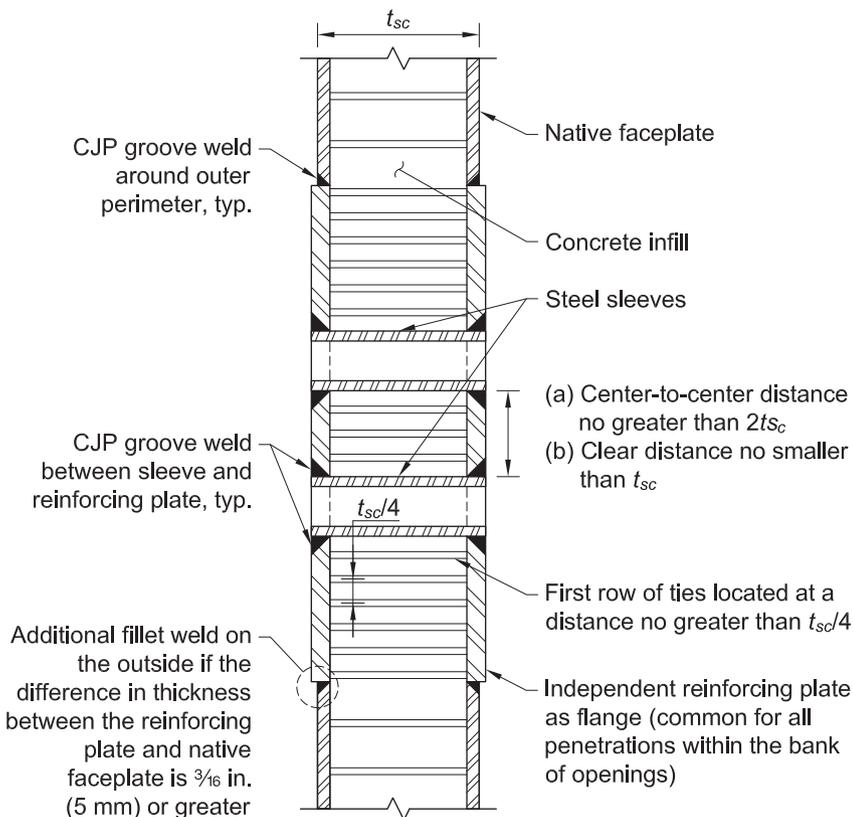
Detailing around openings using an independent reinforcing plate as flange.
